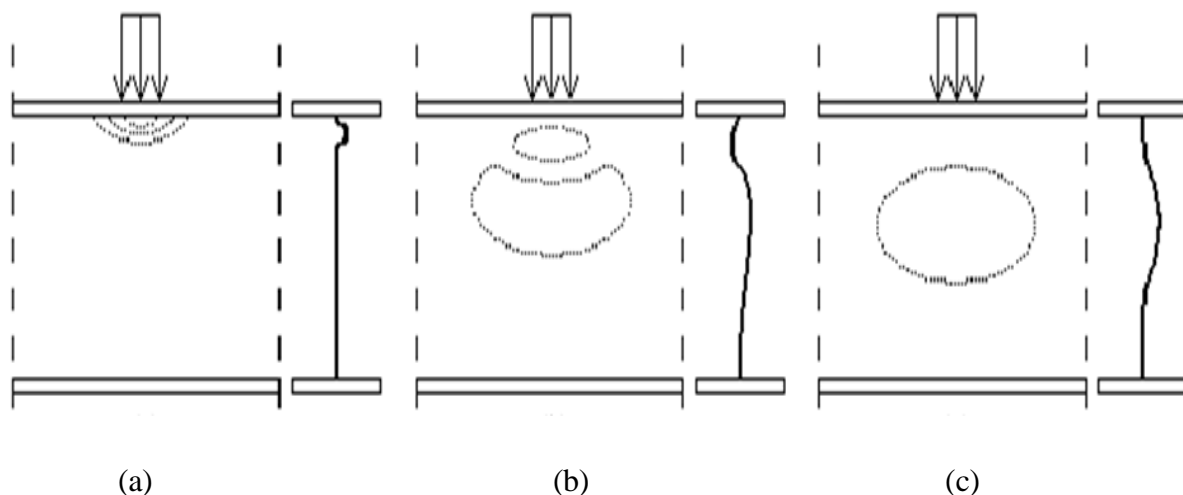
Failure modes for plate girders under concentrated load. Mode (a) yielding, (b) crippling and (c) buckling. Galambos [8]
